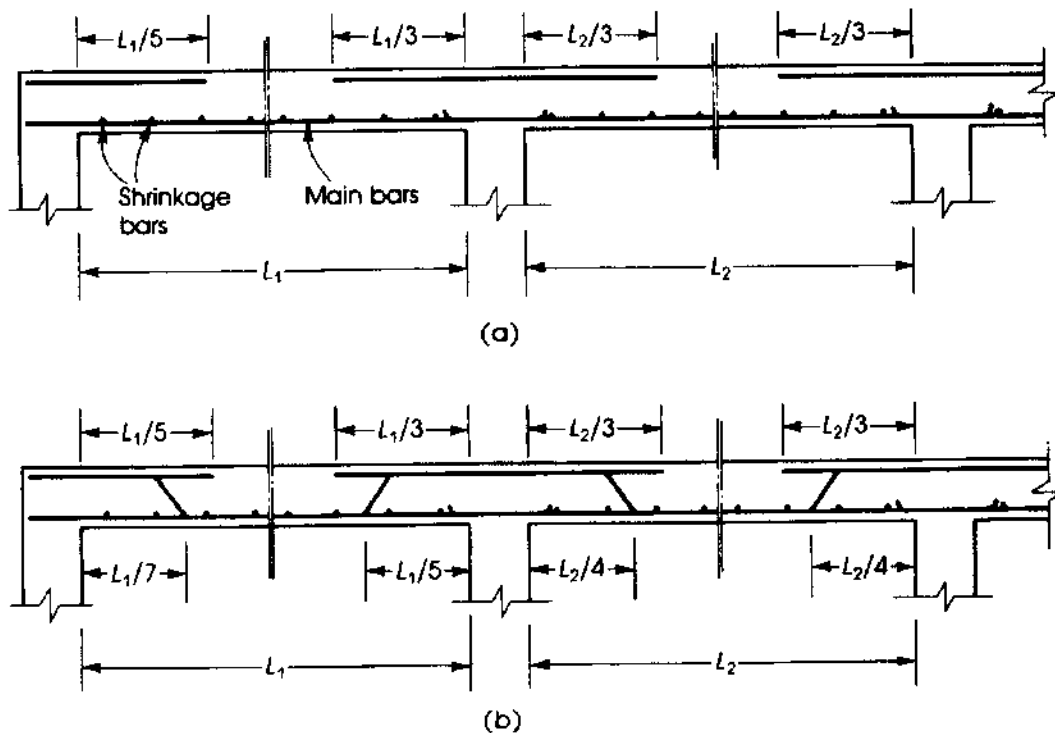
Reinforcement details in continuous one-way slabs: (a) straight bars and (b) bent bars.
